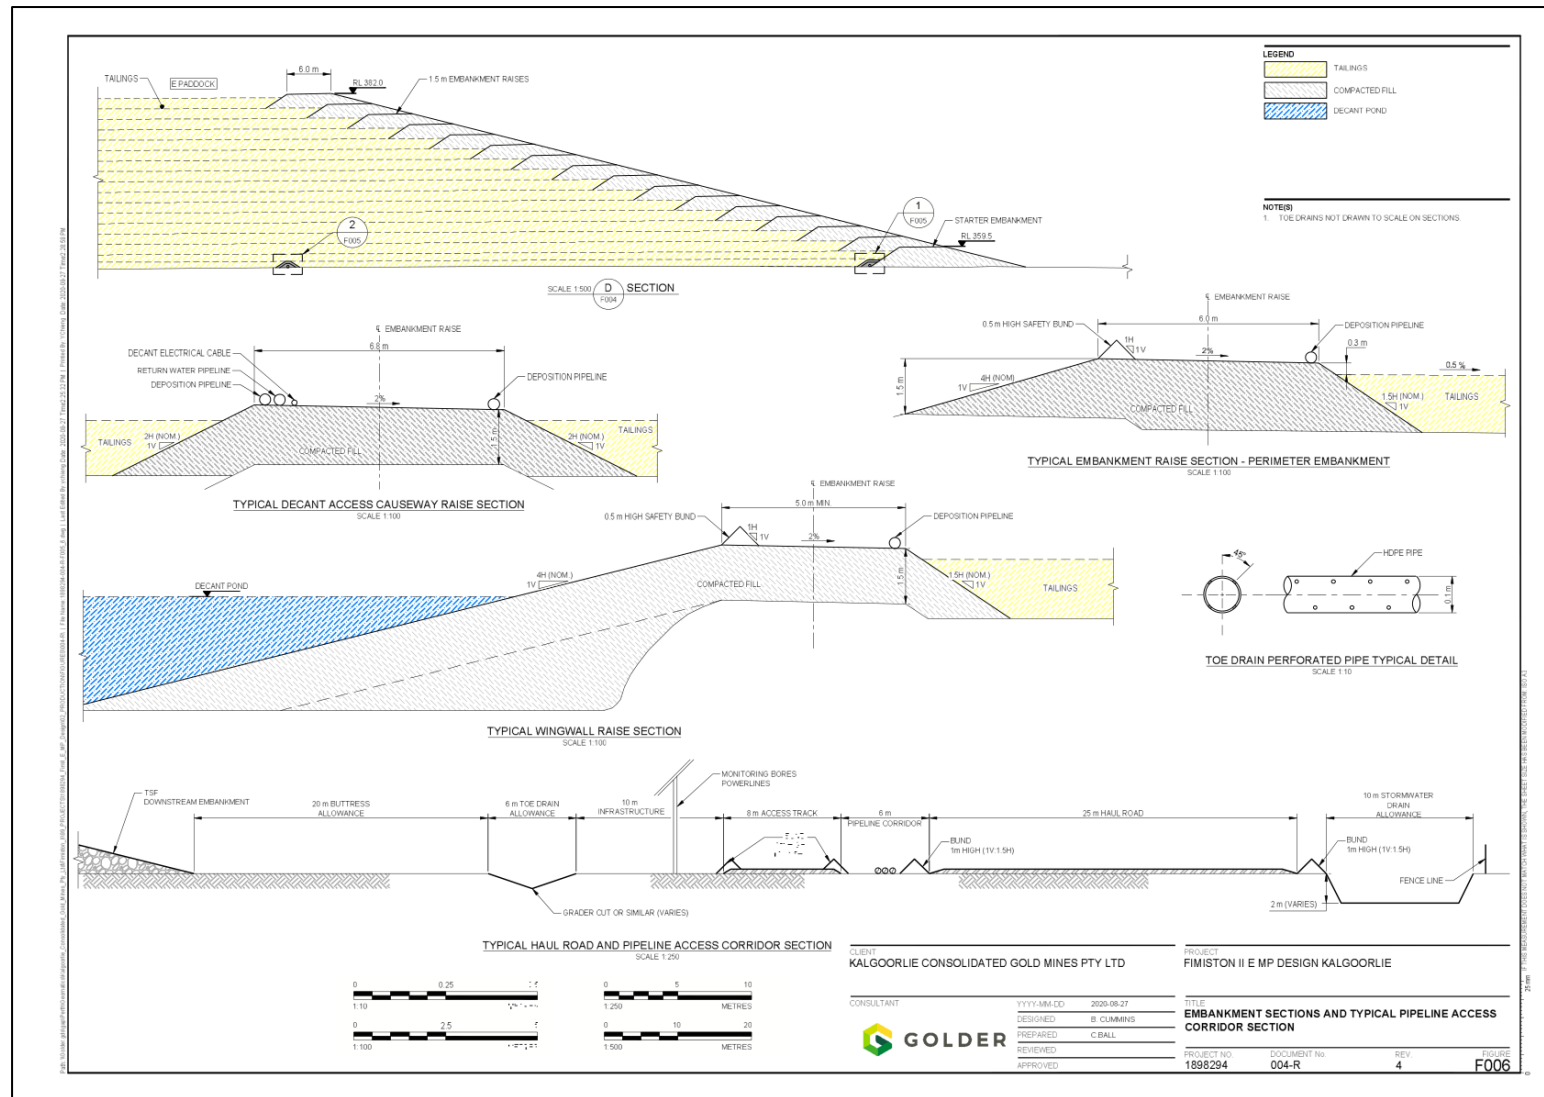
Fimiston II Extension TSF Cell E and F typical embankment raise details
